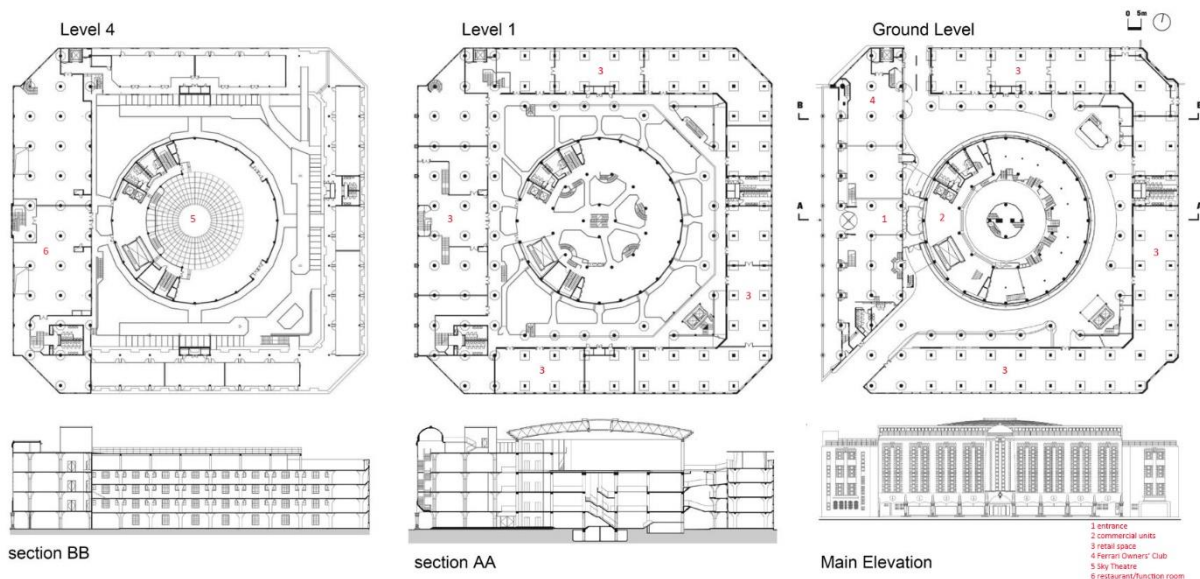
The Slaughterhouse - Plans, sections and main elevation
